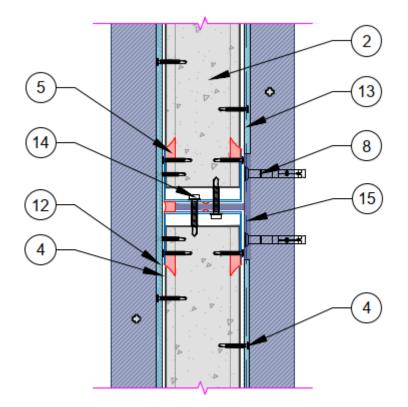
T-bracket connection in dual-stack wall with 6 mm fibre cement lining
